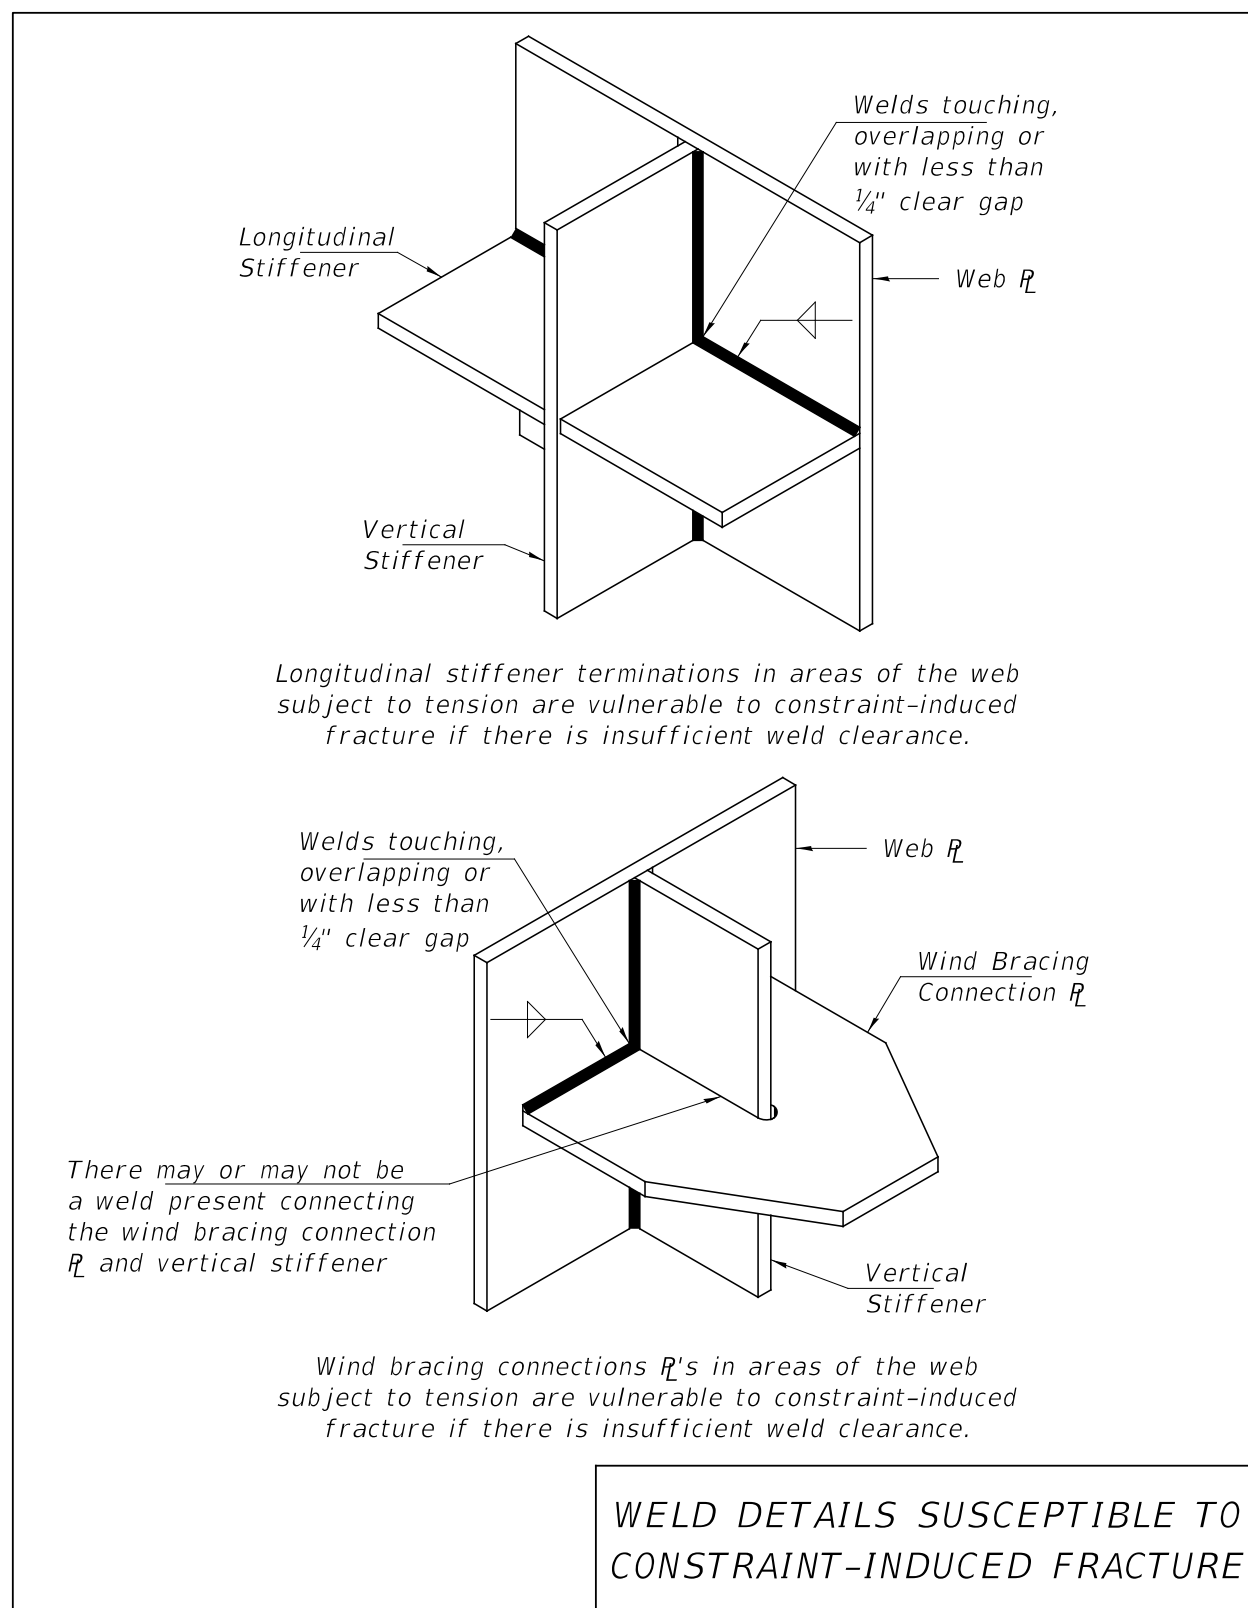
Weld Details Susceptible to Constraint-Induced Fracture
